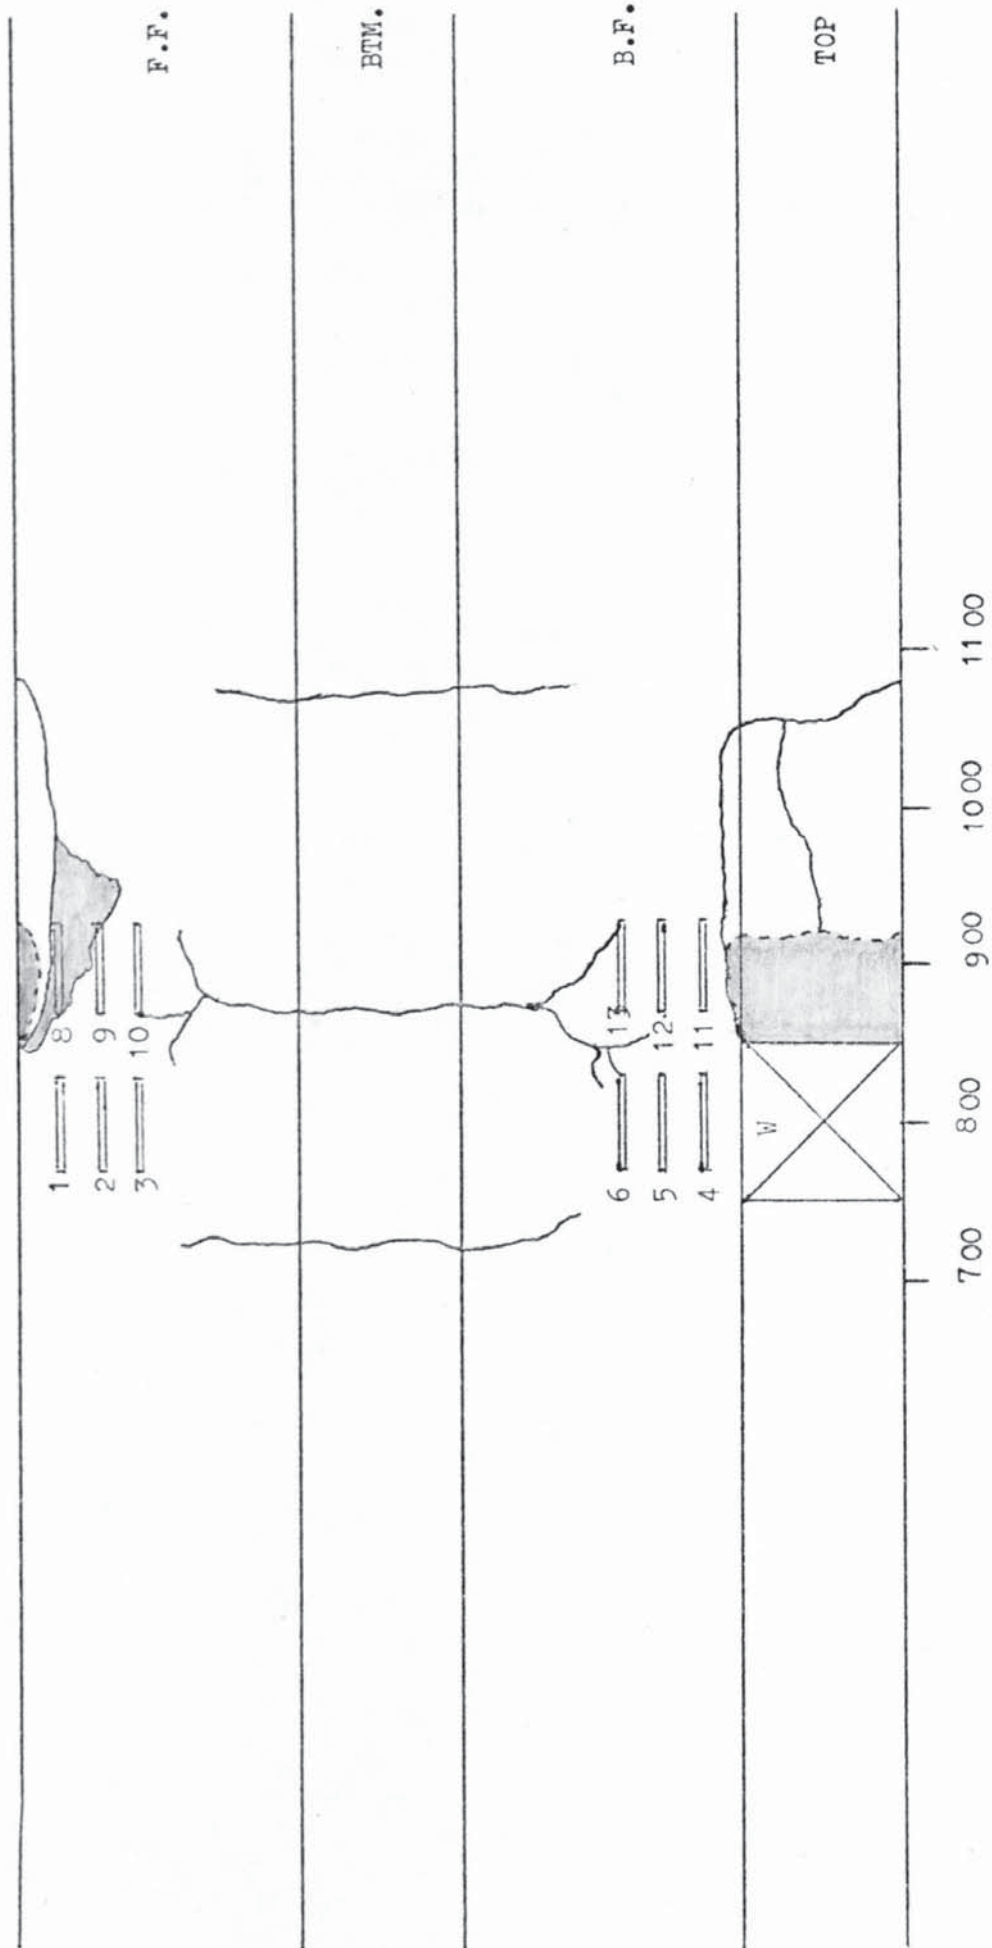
FAILURE CRACK PATTERNS - BEAM 14 (MODE 1)
